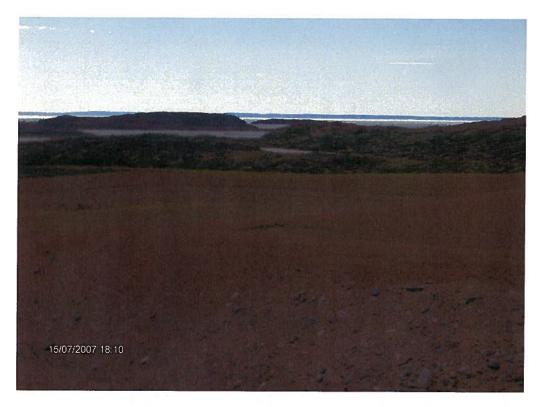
View of Landfarm Facility prior to use. Note sump pit on the left hand side.
